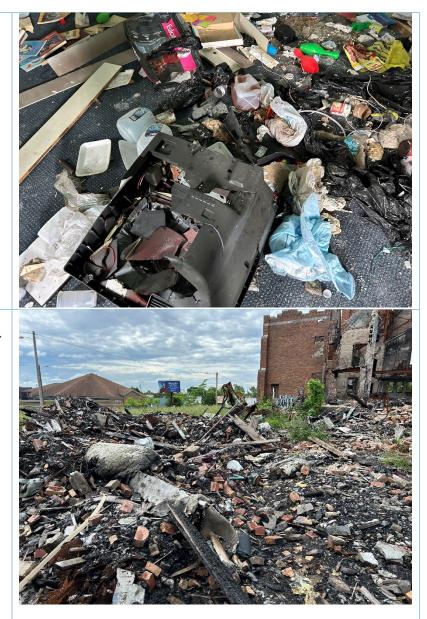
Gray Floor Tile Found in the Debris Pile on the Exterior DATE: 28 06 2024
